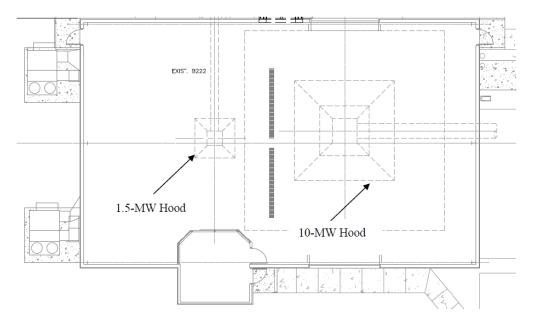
Plan View Schematic of SwRI's Calorimetry Test Facility.
